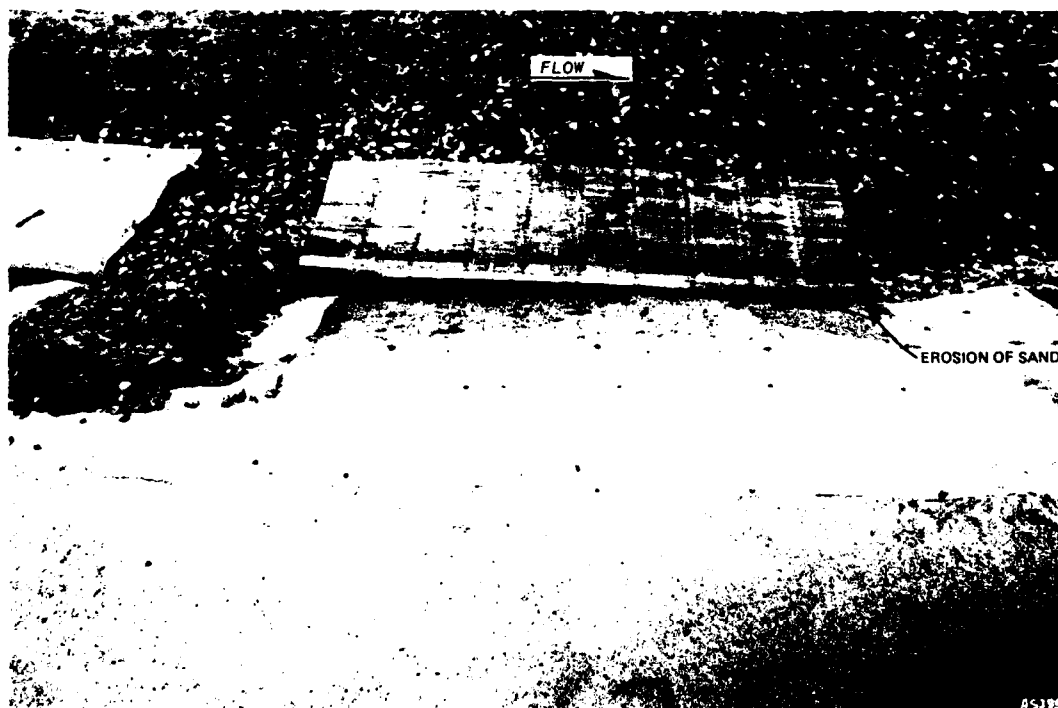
Model of M8A1 steel mat panels rolled back after second test.
